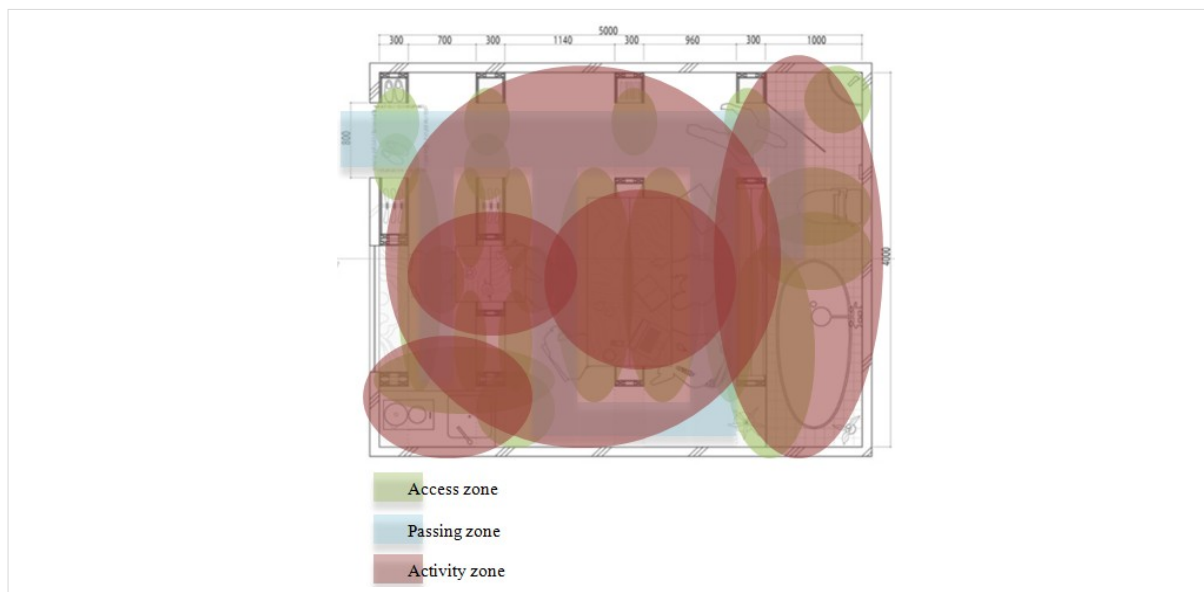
Zones overlapping - example of case study where flexible dwelling interior is less than 37 m².
